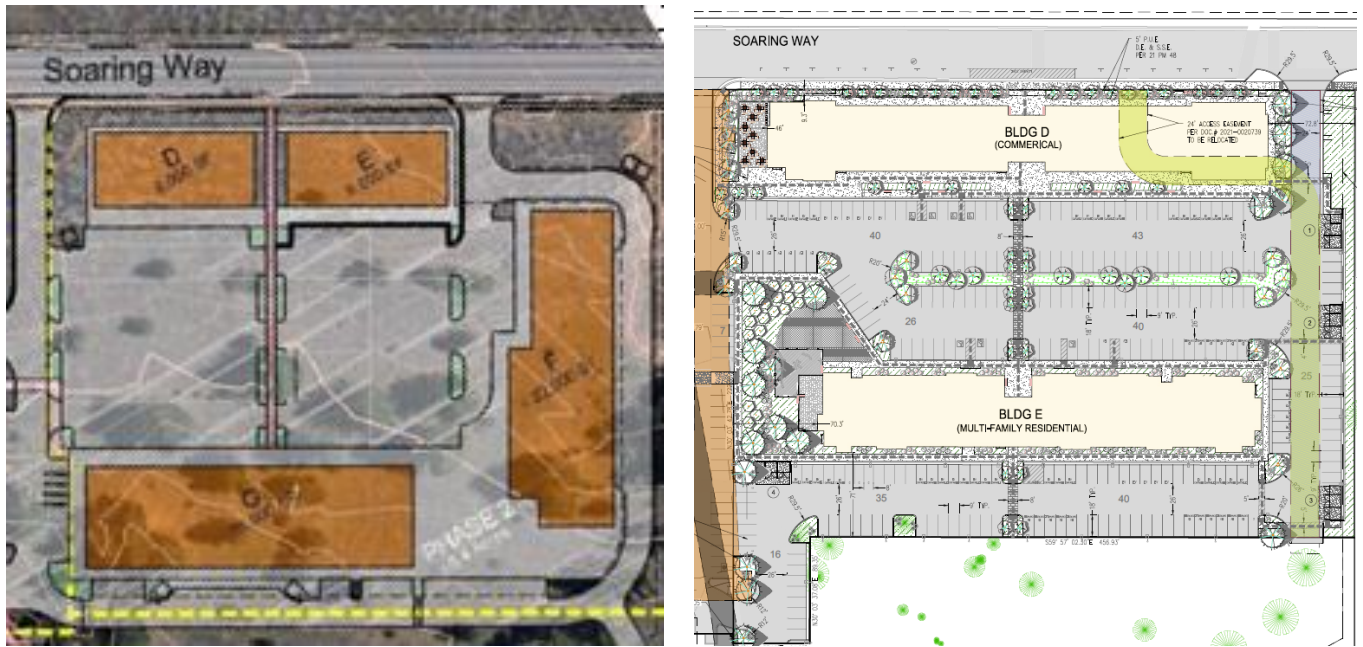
Previously Approved 2018 Site Plan (left); Proposed 2025 Site Plan (right)
